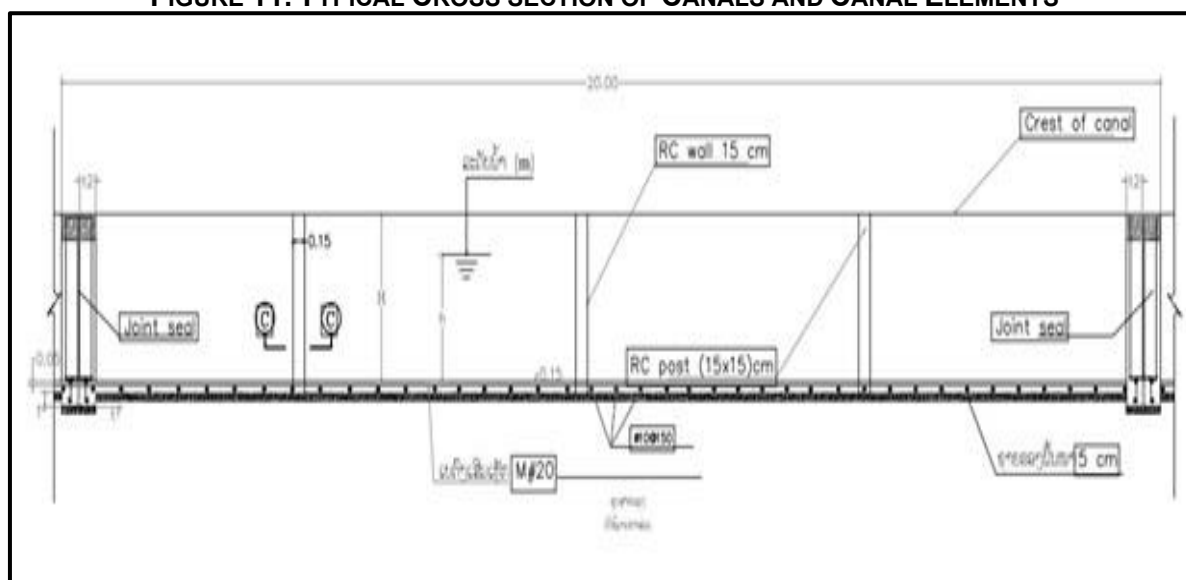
TYPICAL CROSS SECTION OF CANALS AND CANAL ELEMENTS
